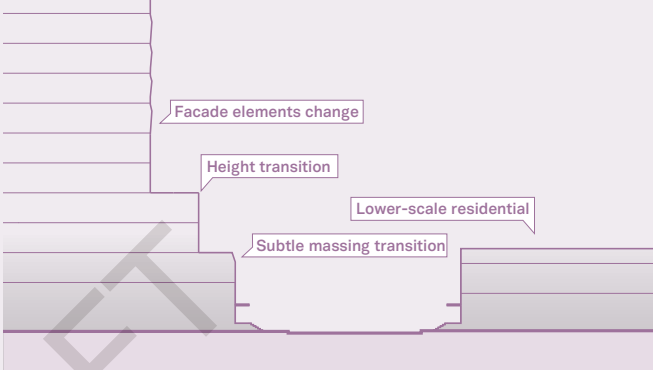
Tall buildings should provide transitions to adjacent low-scale residential district.
